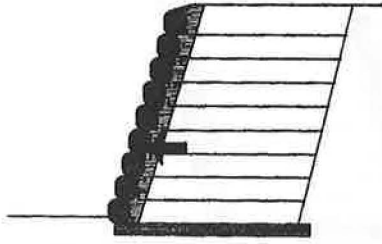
Connection Failure - The connections of the reinforcing geosynthetics to the wall facing is not strong enough and they rupture or disconnect.
